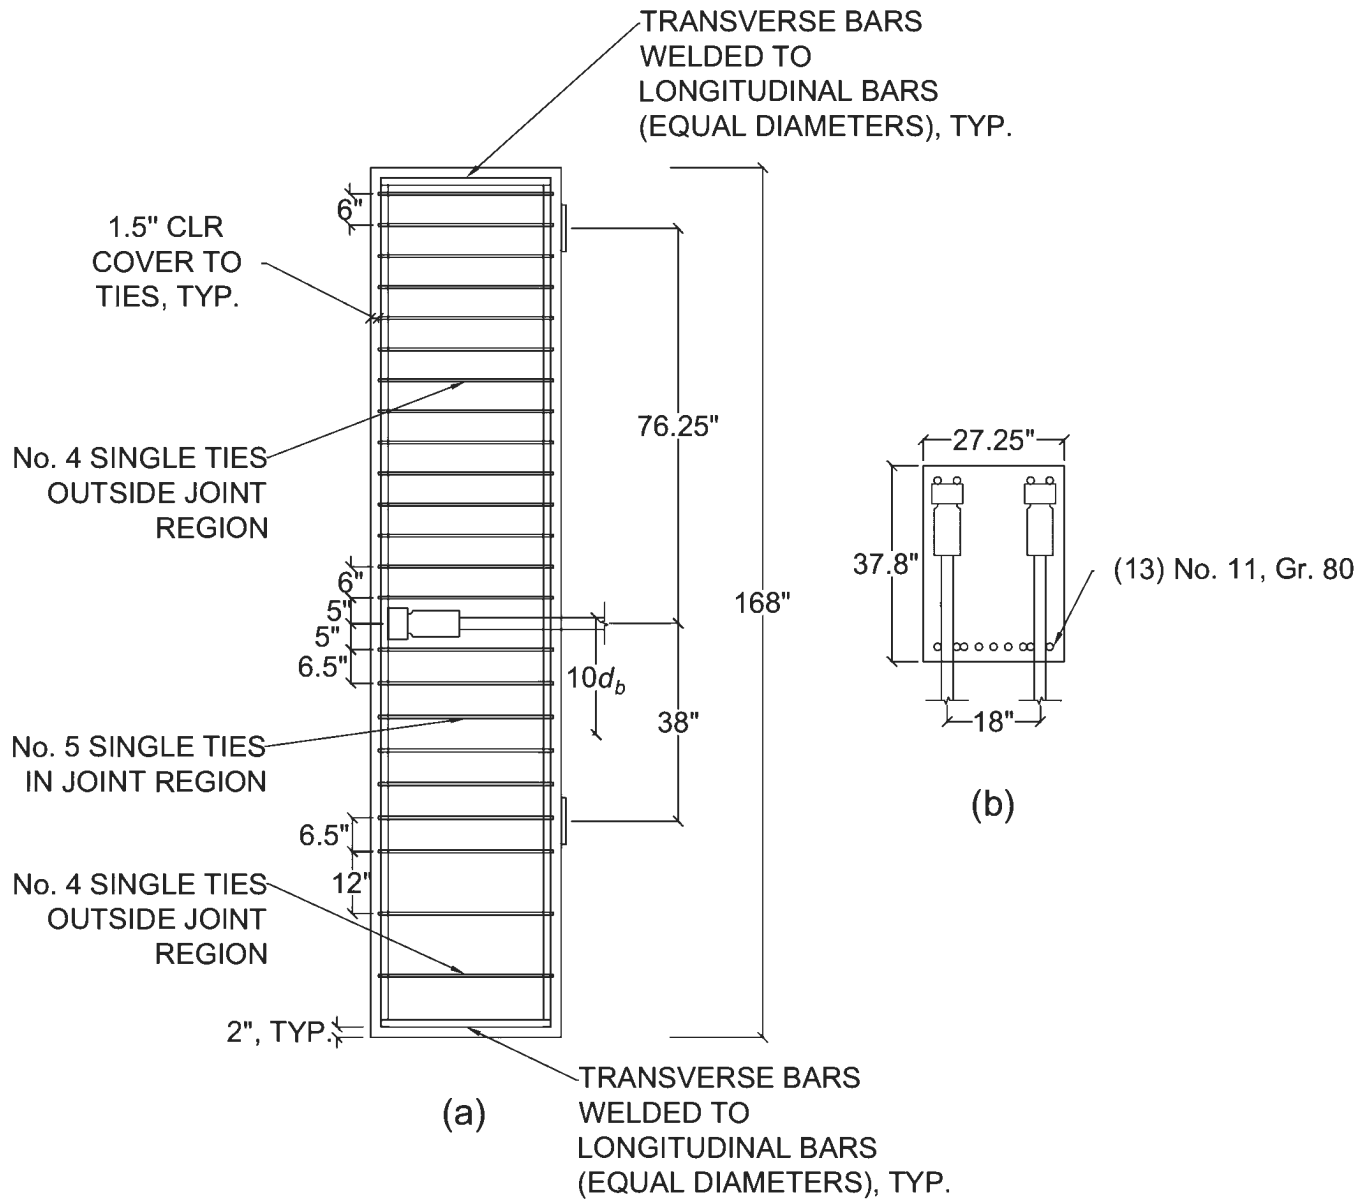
Details of reinforcement layout for No. 18 headed bar specimen 18-3: (a) elevation, (b) cross-section
